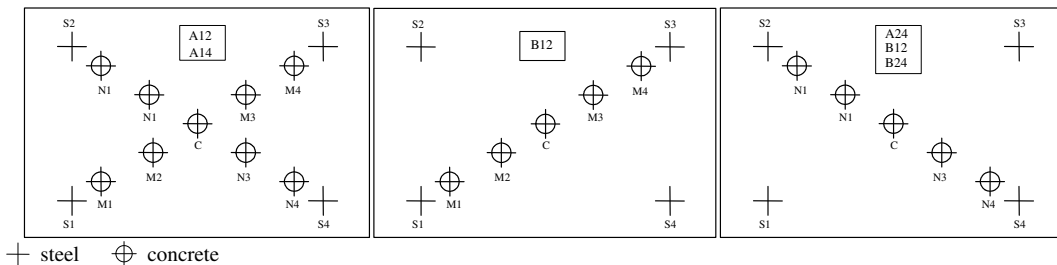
Location of thermocouples within cross-section (detail size ref. Table 2).
